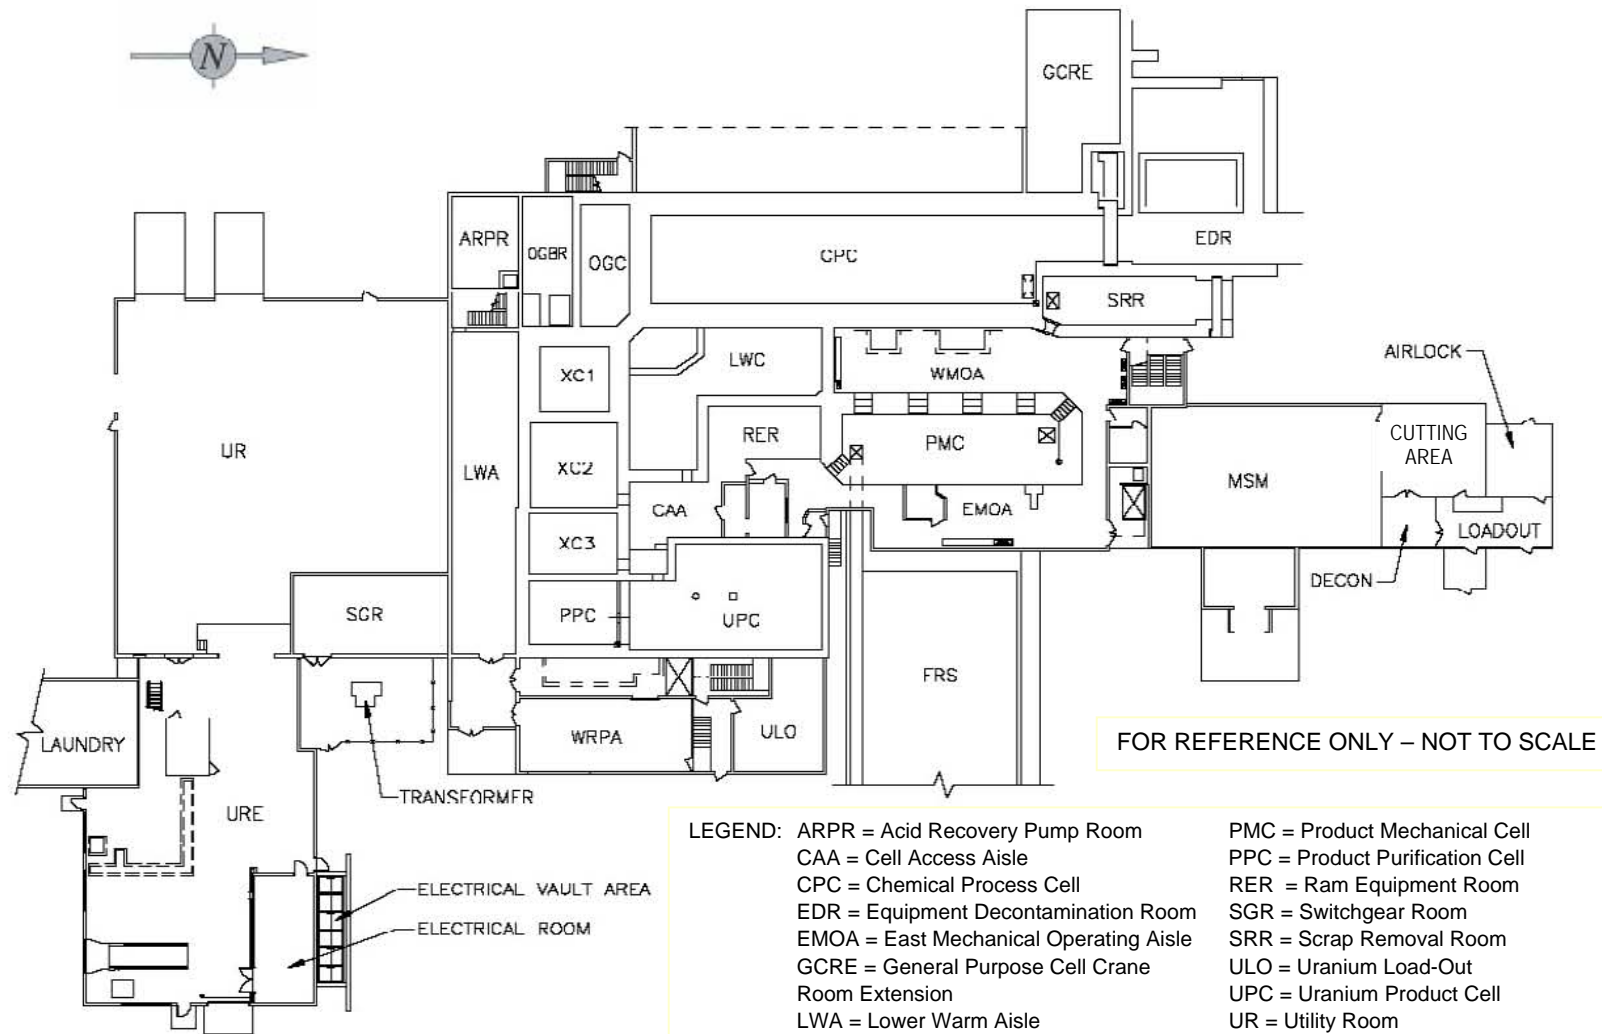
B. Process Building Layout at 100-Foot Elevation
